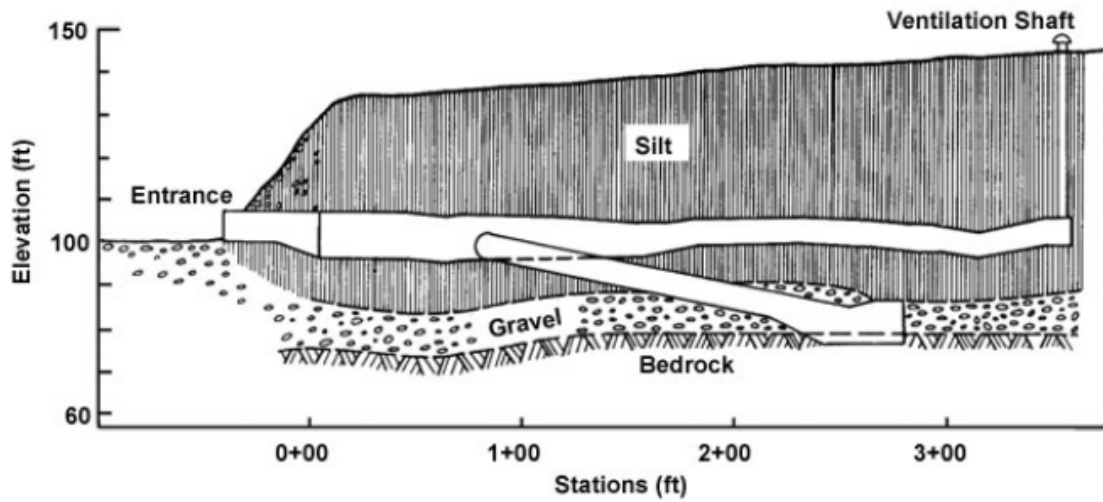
Schematic Plot of Cross Section Diagram of the CRREL Tunnel
